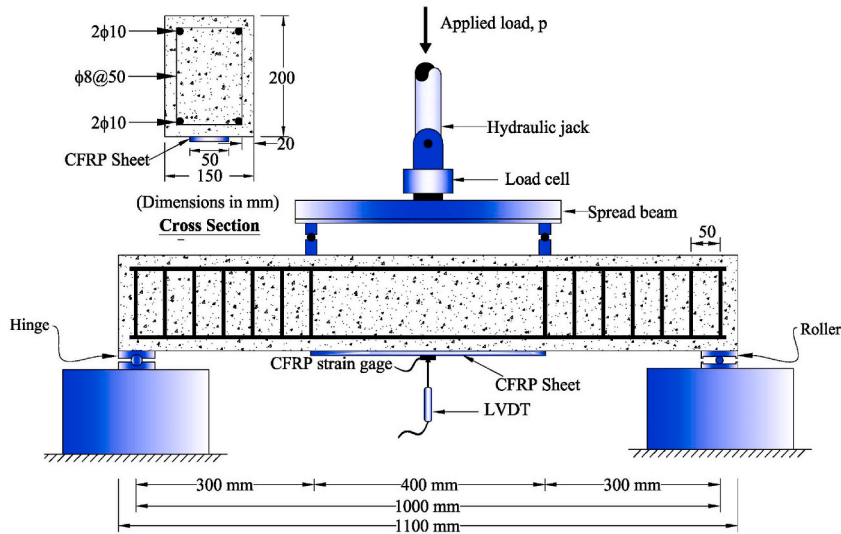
Beams reinforcement, dimensions, instrumentations, and test setup.
